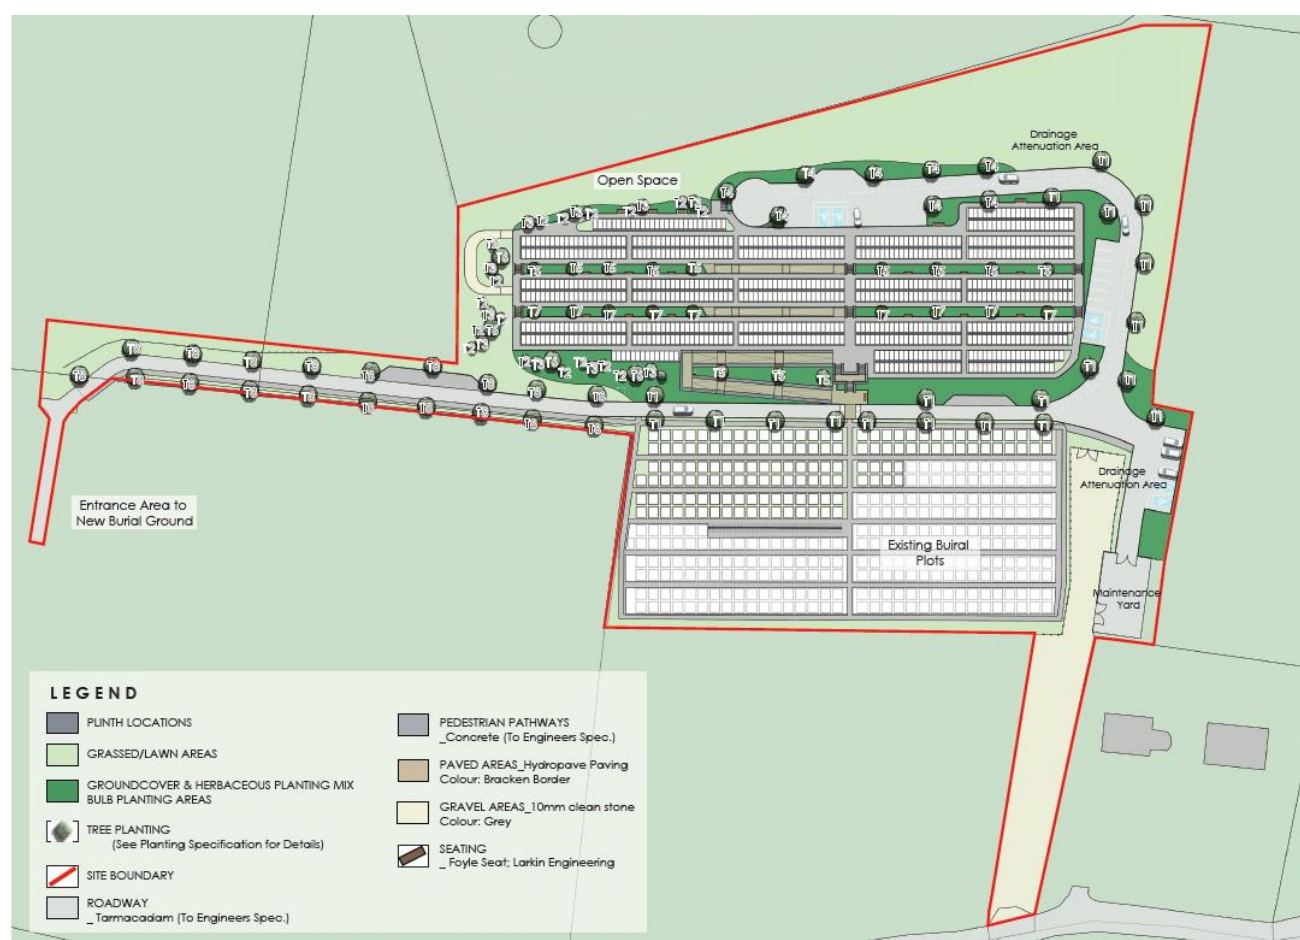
Site Landscape Masterplan (Source: Cormac Langan Landscape Architecture)
